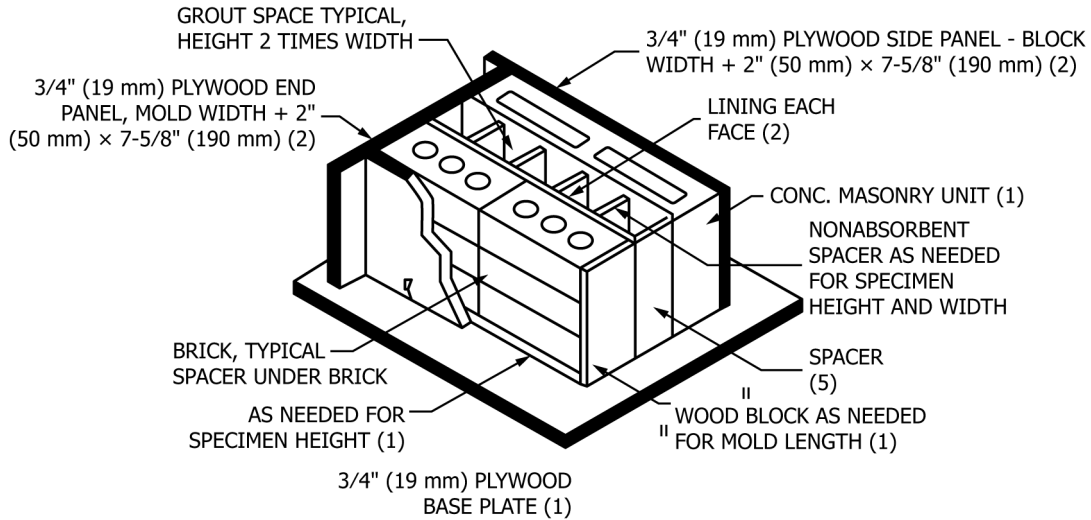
Example of Grout Mold with Brick and Concrete Masonry Units
